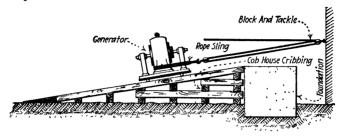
Rolling an electrical machine onto a high foundation by cribbing up a runway.
